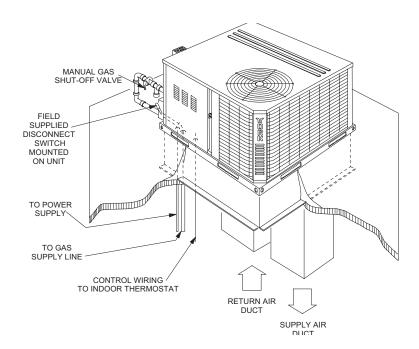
TYPICAL ROOF CURB INSTALLATION
